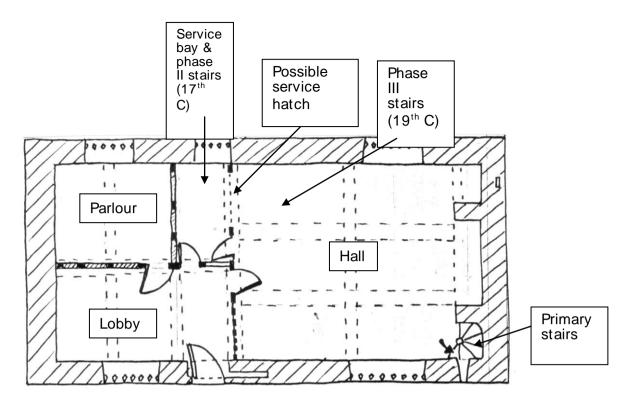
Reconstruction of original ground floor plan at Dolbelydr (P Welford)
